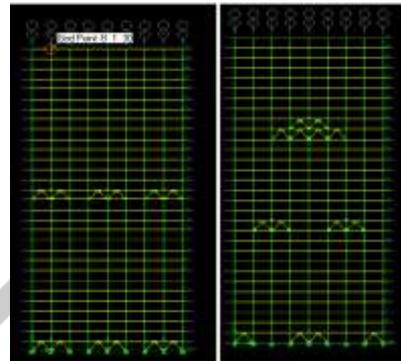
Elevations of the structural Model with Bracing System with Floating column
